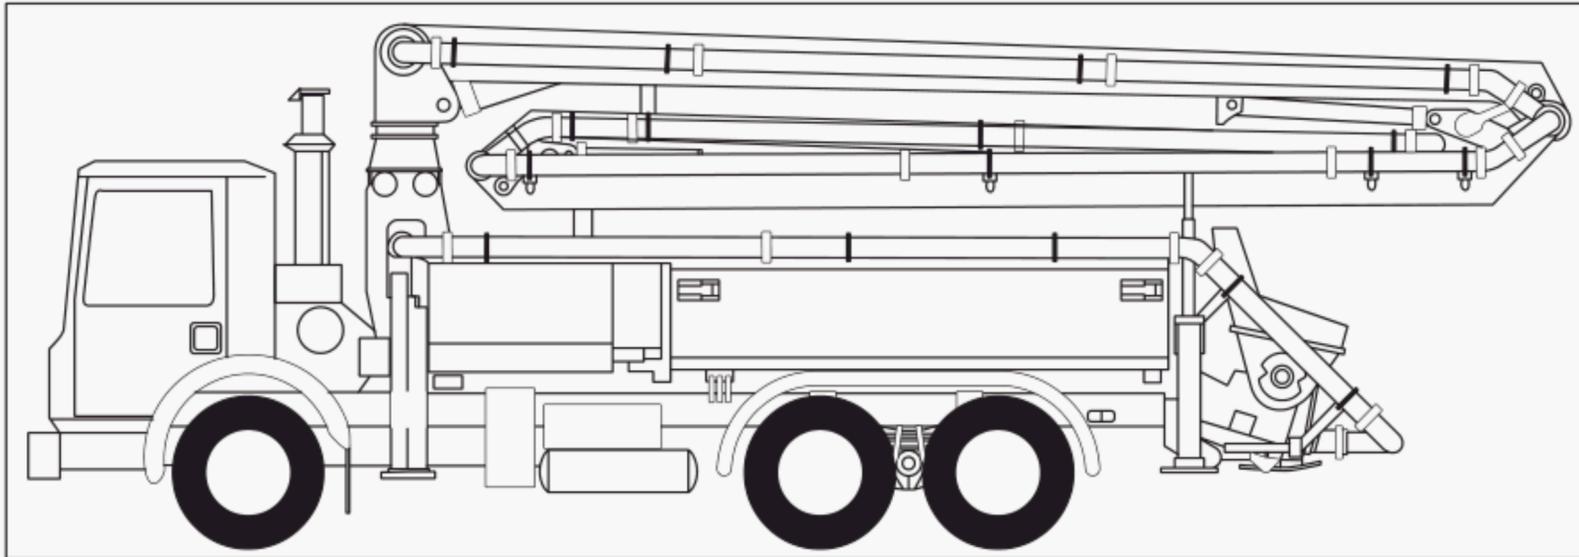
Material Placement System: Truck-Mounted Concrete Pump With Integrated Placing Boom
